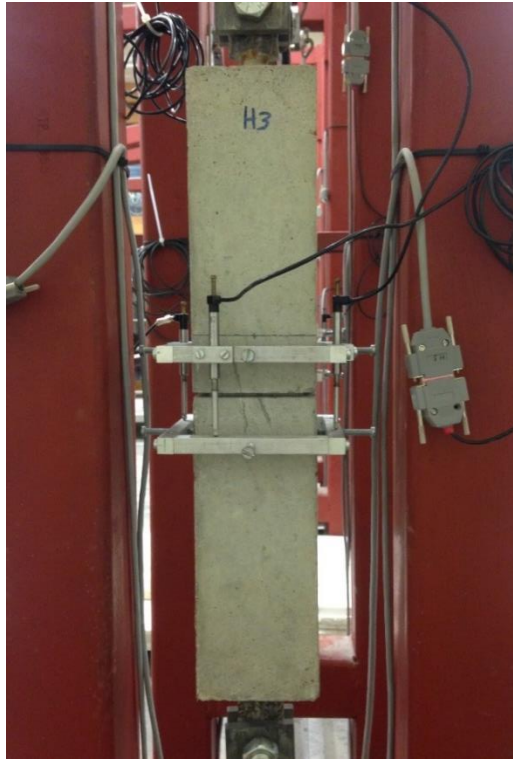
Removable aluminium frame used in the uniaxial tensile creep tests.
